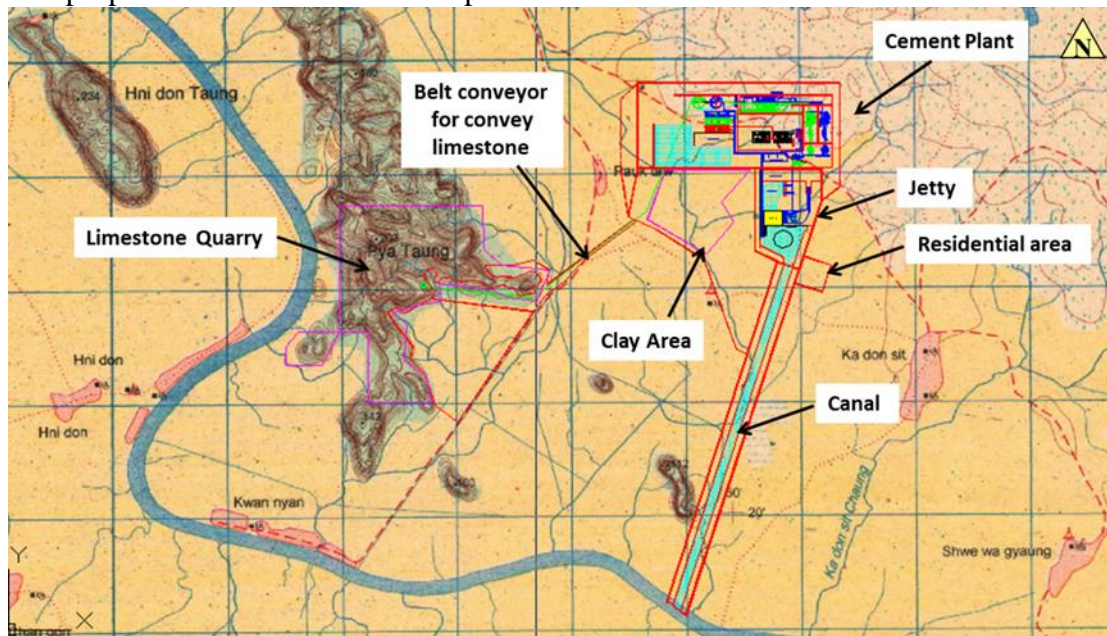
Preliminary Layout of Cement Plant & its Facilities
